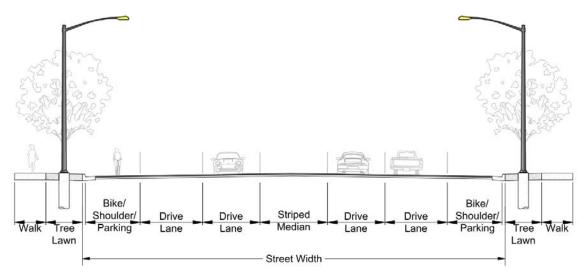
Typical Arterial with Continuous Street Lighting Cross Section
